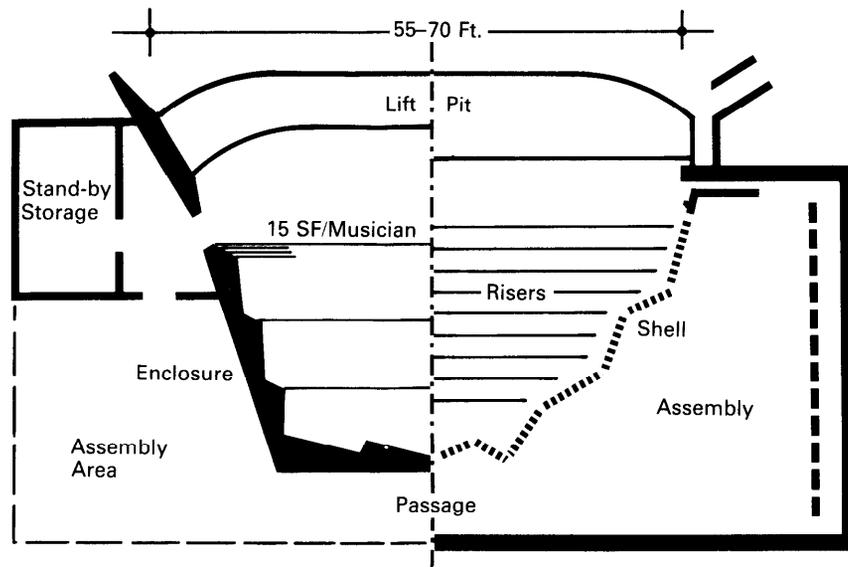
ORCHESTRAL-CHORAL STAGE
